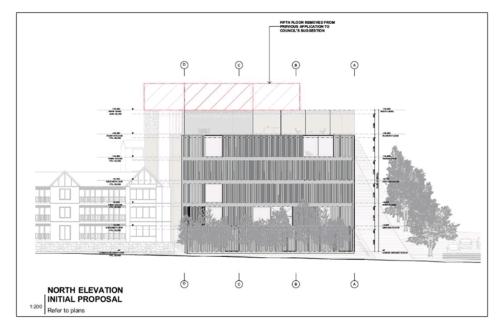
Northern elevation along Sandy Bay Road (source: Room 11 Architects)
